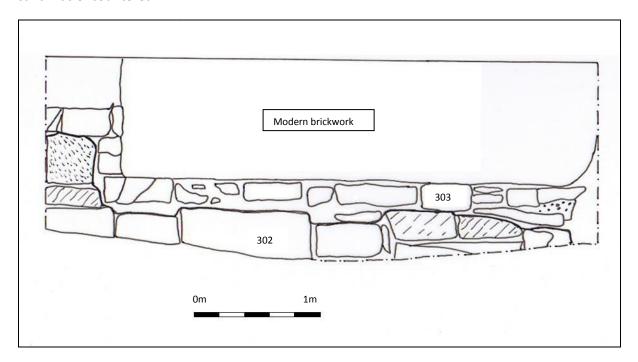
South facing section showing possible original stonework 302 and rebuild 303
